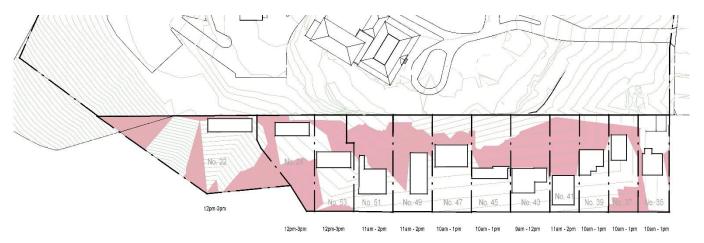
Existing Site Conditions – Winter Shading – External Area with 3 hours Natural Light
